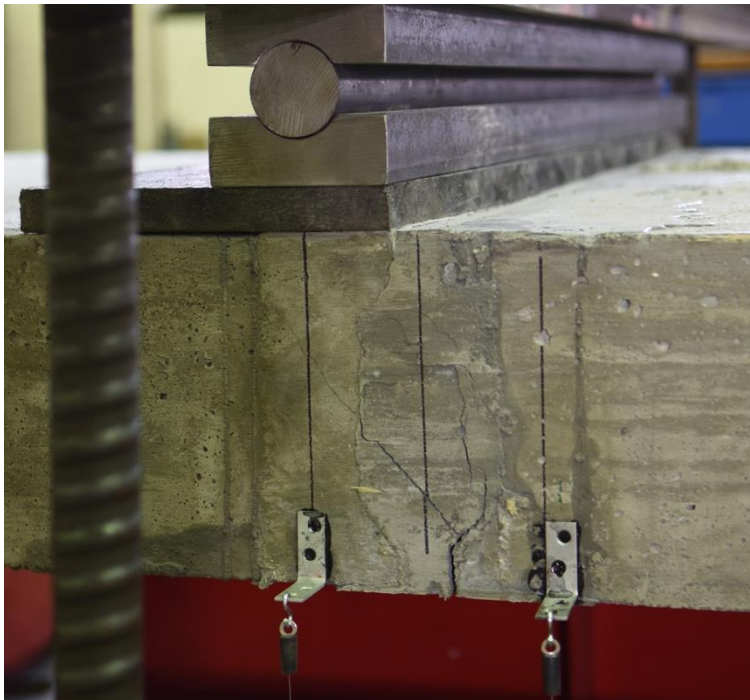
Inclined Cracking through the Grout (Specimen F-F-2)
